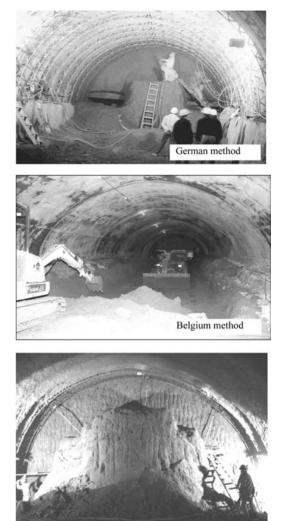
Various shotcrete tunneling methods in the construction of Metro tunnels in Buenos Aires (by *Sfriso*).
